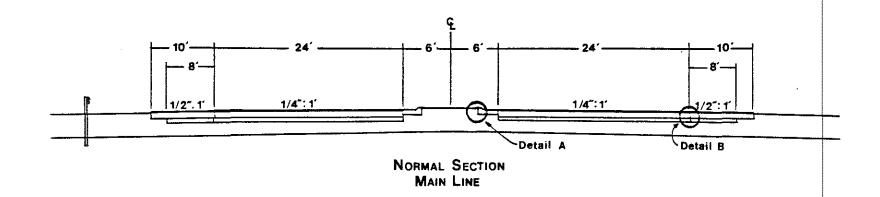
Typical Section and Detail for Main Line Section STA 793+00 to STA 915+00 (Section D).
